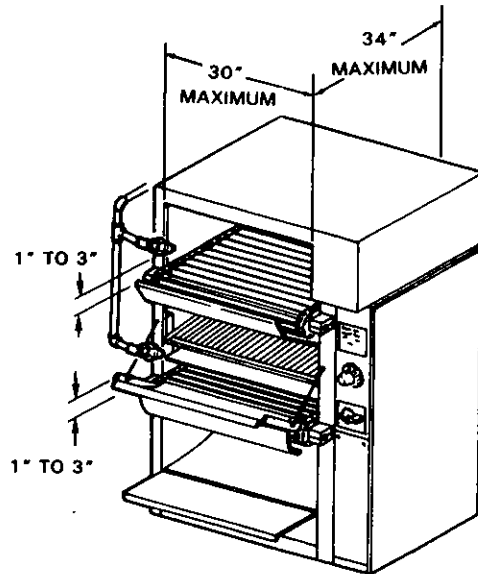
Nozzle Location, Automatic Broiler with Closed Hood.
